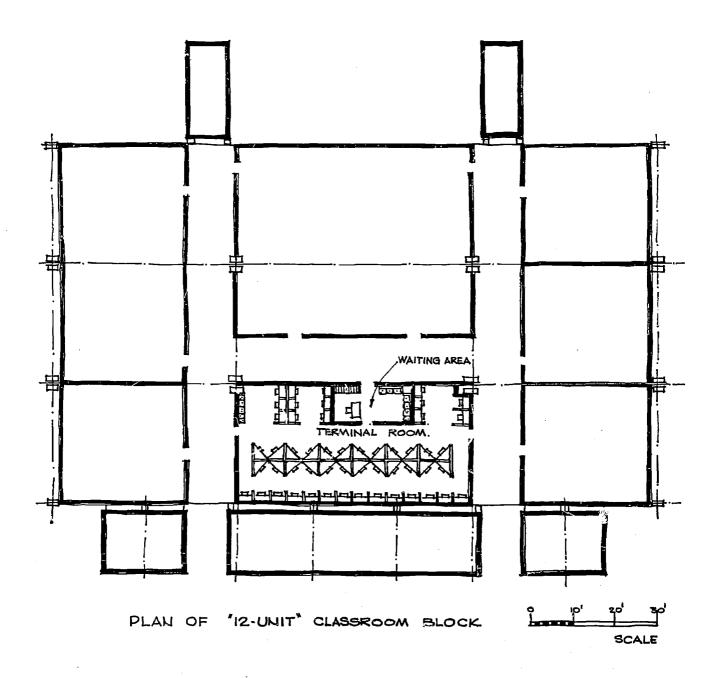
ONE TERMINAL ROOM PER 12-UNIT CLASSROOM BLOCK
